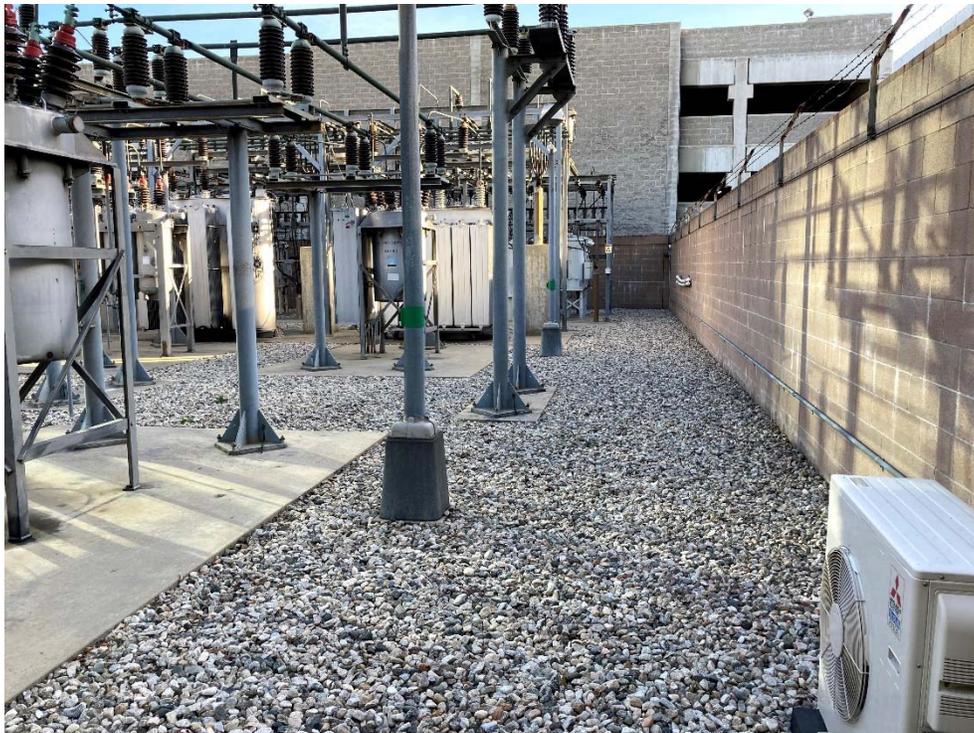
The yard area was mostly gravel with concrete equipment footings and walkways. The view is to the east from the southwestern corner.
